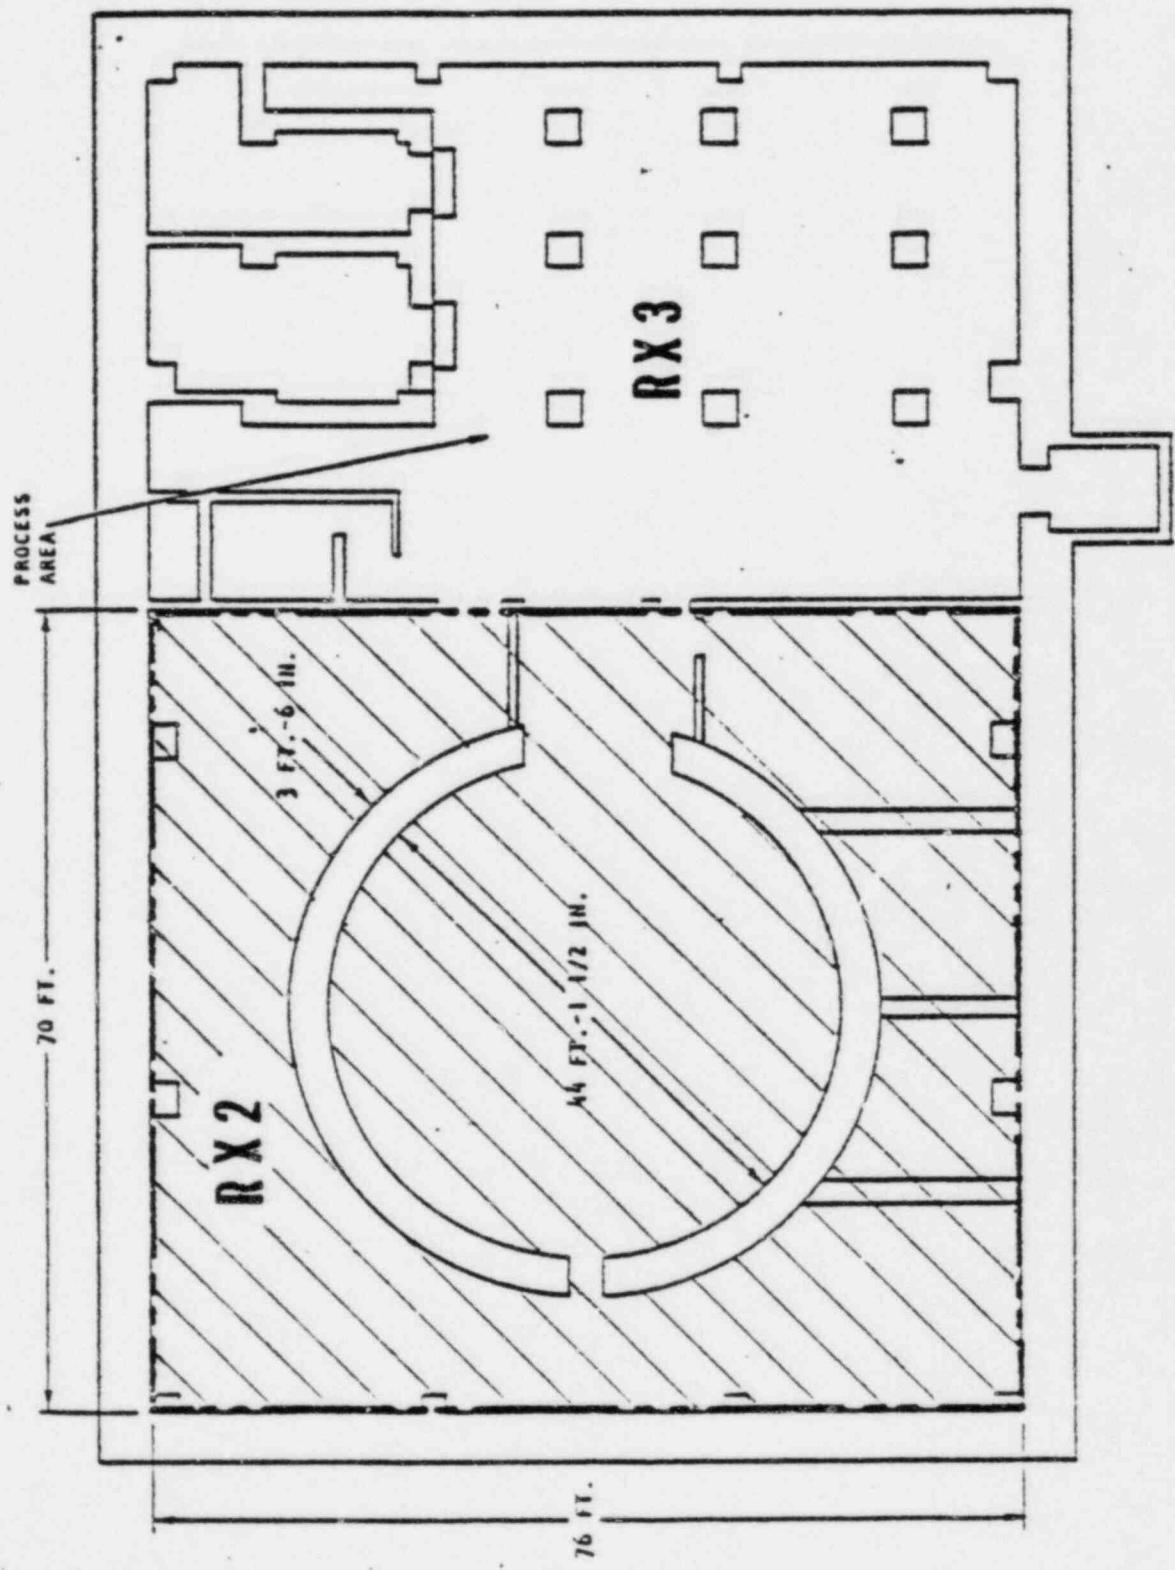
Reactor building plan view at elevation 4740 ft.-6 in. showing region of detailed analysis
